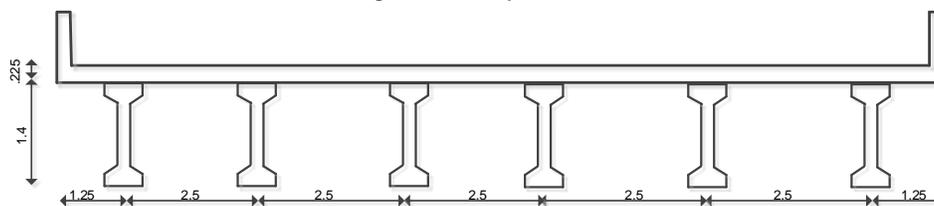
Elevation view of a slab-on-girders bridge (a deck with 6 girders); dimensions in m
